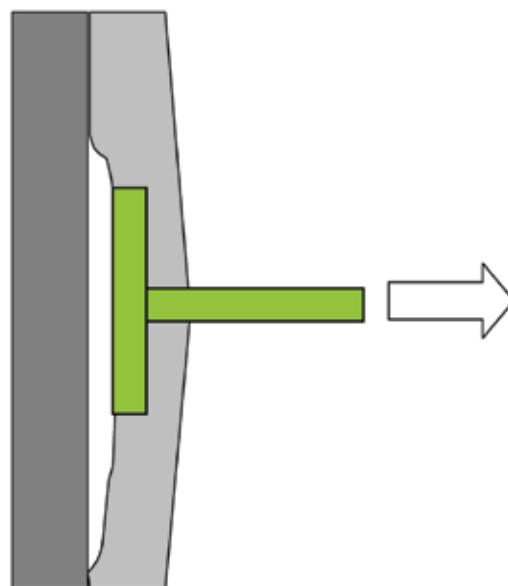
Adhesion failure of bond followed by flexural bending failure of shotcrete
